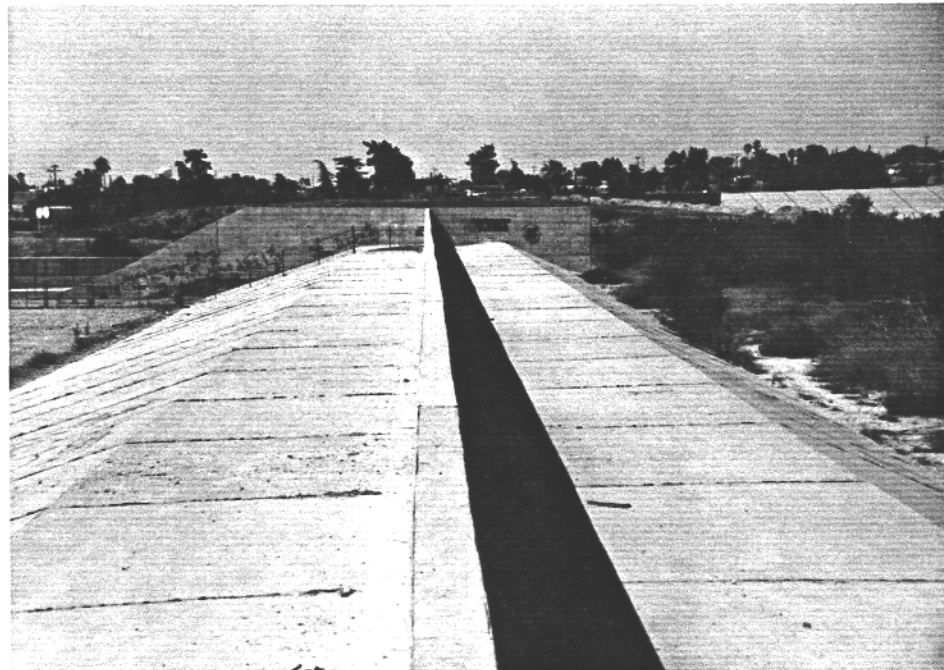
Looking SW Along Spillway Levee Wall Modification To Original Bypass Spillway Toward Inlet To Lytle Creek East Branch Channel And Control House At Lytle Creek West Branch Channel.
